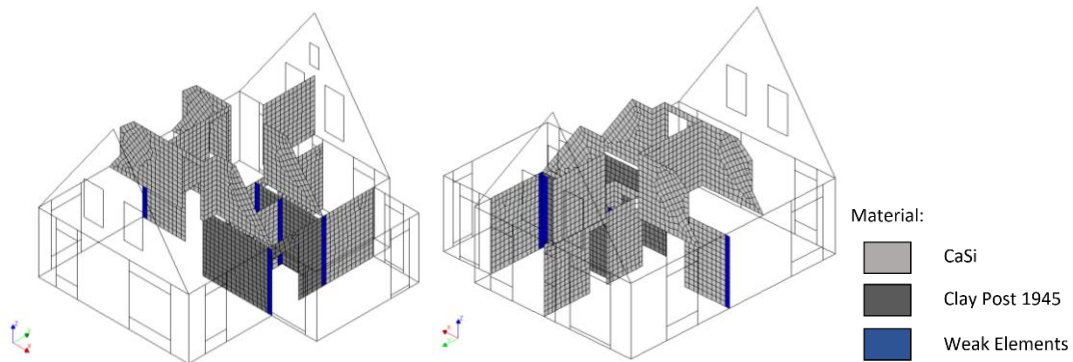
Internal walls material. Weak element connection is highlighted in blue.
